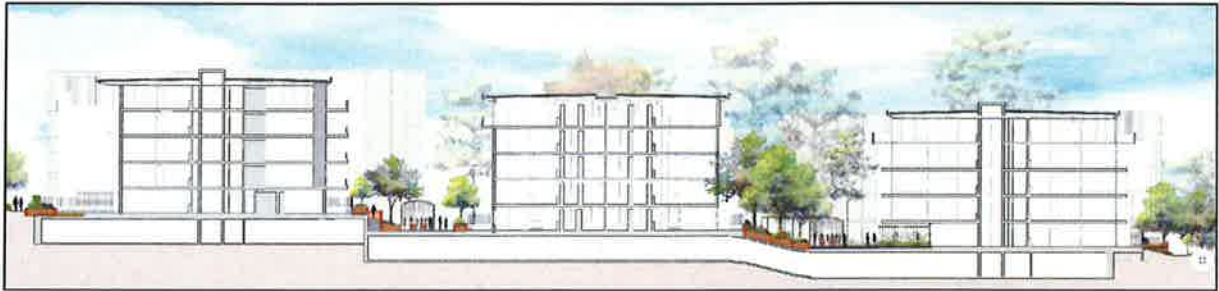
Section through the site showing proposed tree planting between the buildings (source: Mod 7 landscape plans)
